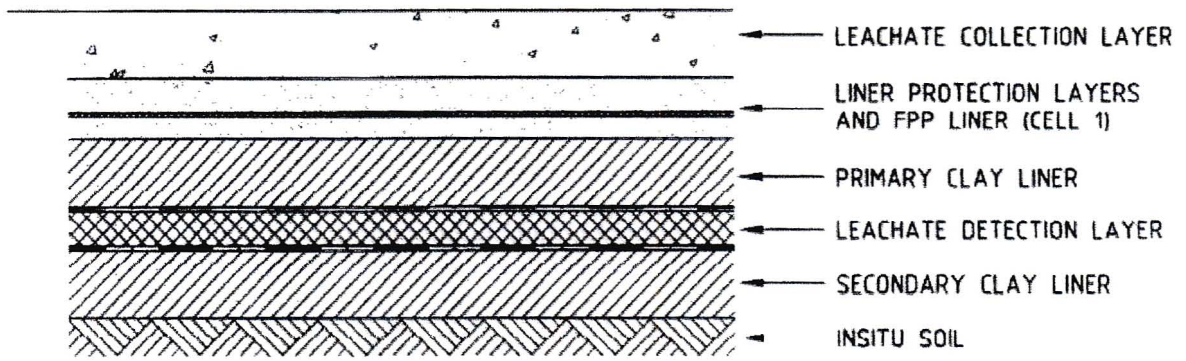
Cross-section of a typical composite lining system for a South African MSW landfill.
